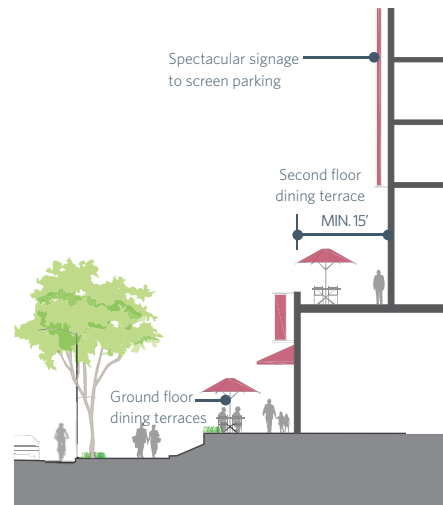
Section depicting the second floor dining terrace setback on the two block core opposite Citi Field
